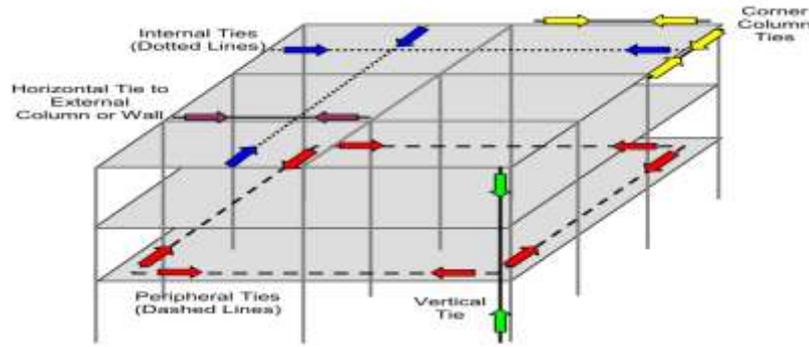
Tie forces in a frame structure for Accidental Actions [9].
